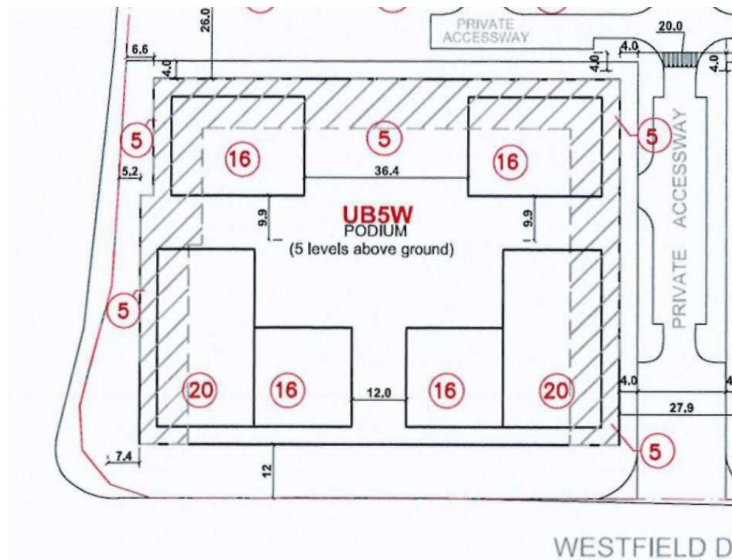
Building Separation Plan Stage 1 consent DA-14/96
